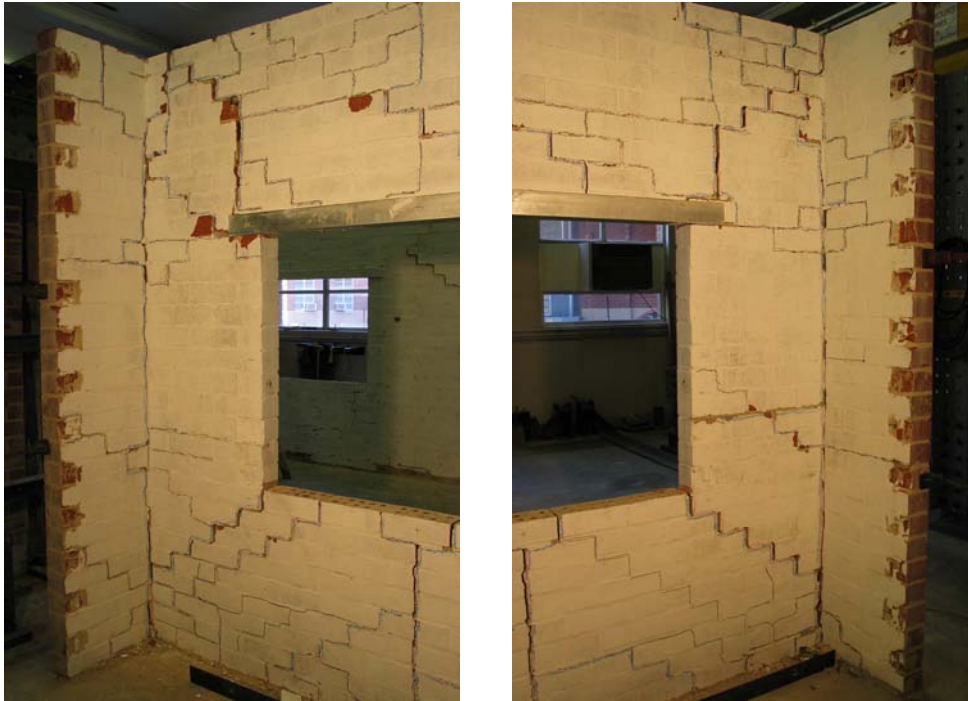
Photograph of wall s7 crack pattern at the conclusion of cyclic testing.
